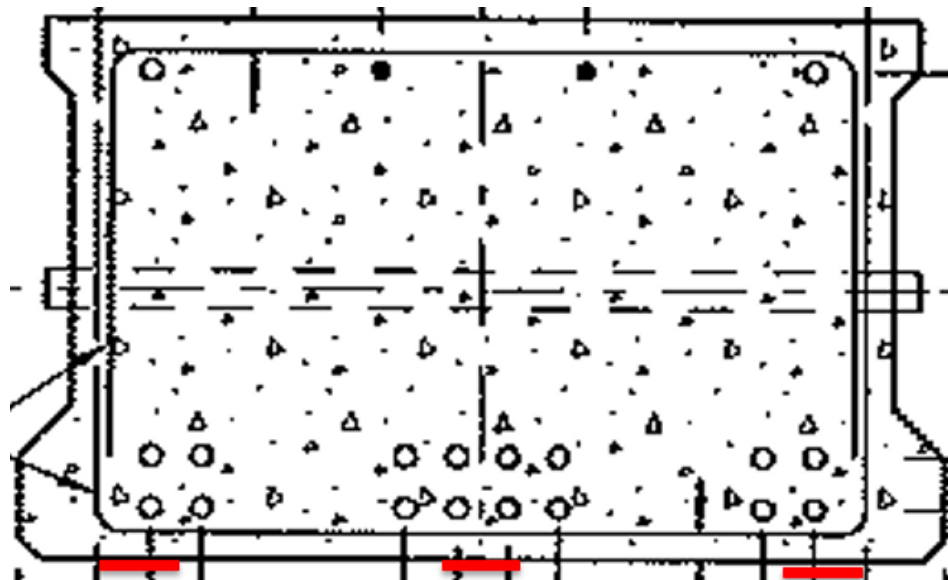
Schematic Drawing of Strain Gauge Mount Position on Solid Slab Girders 13 and 14
